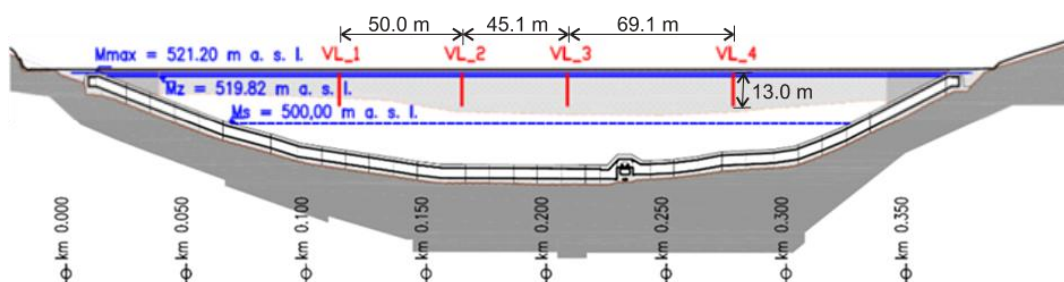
Longitudinal section through the grouting gallery – the situation of the dam sealing wall and EIS monitoring probes VL_1, VL_2, VL_3 and VL_4
